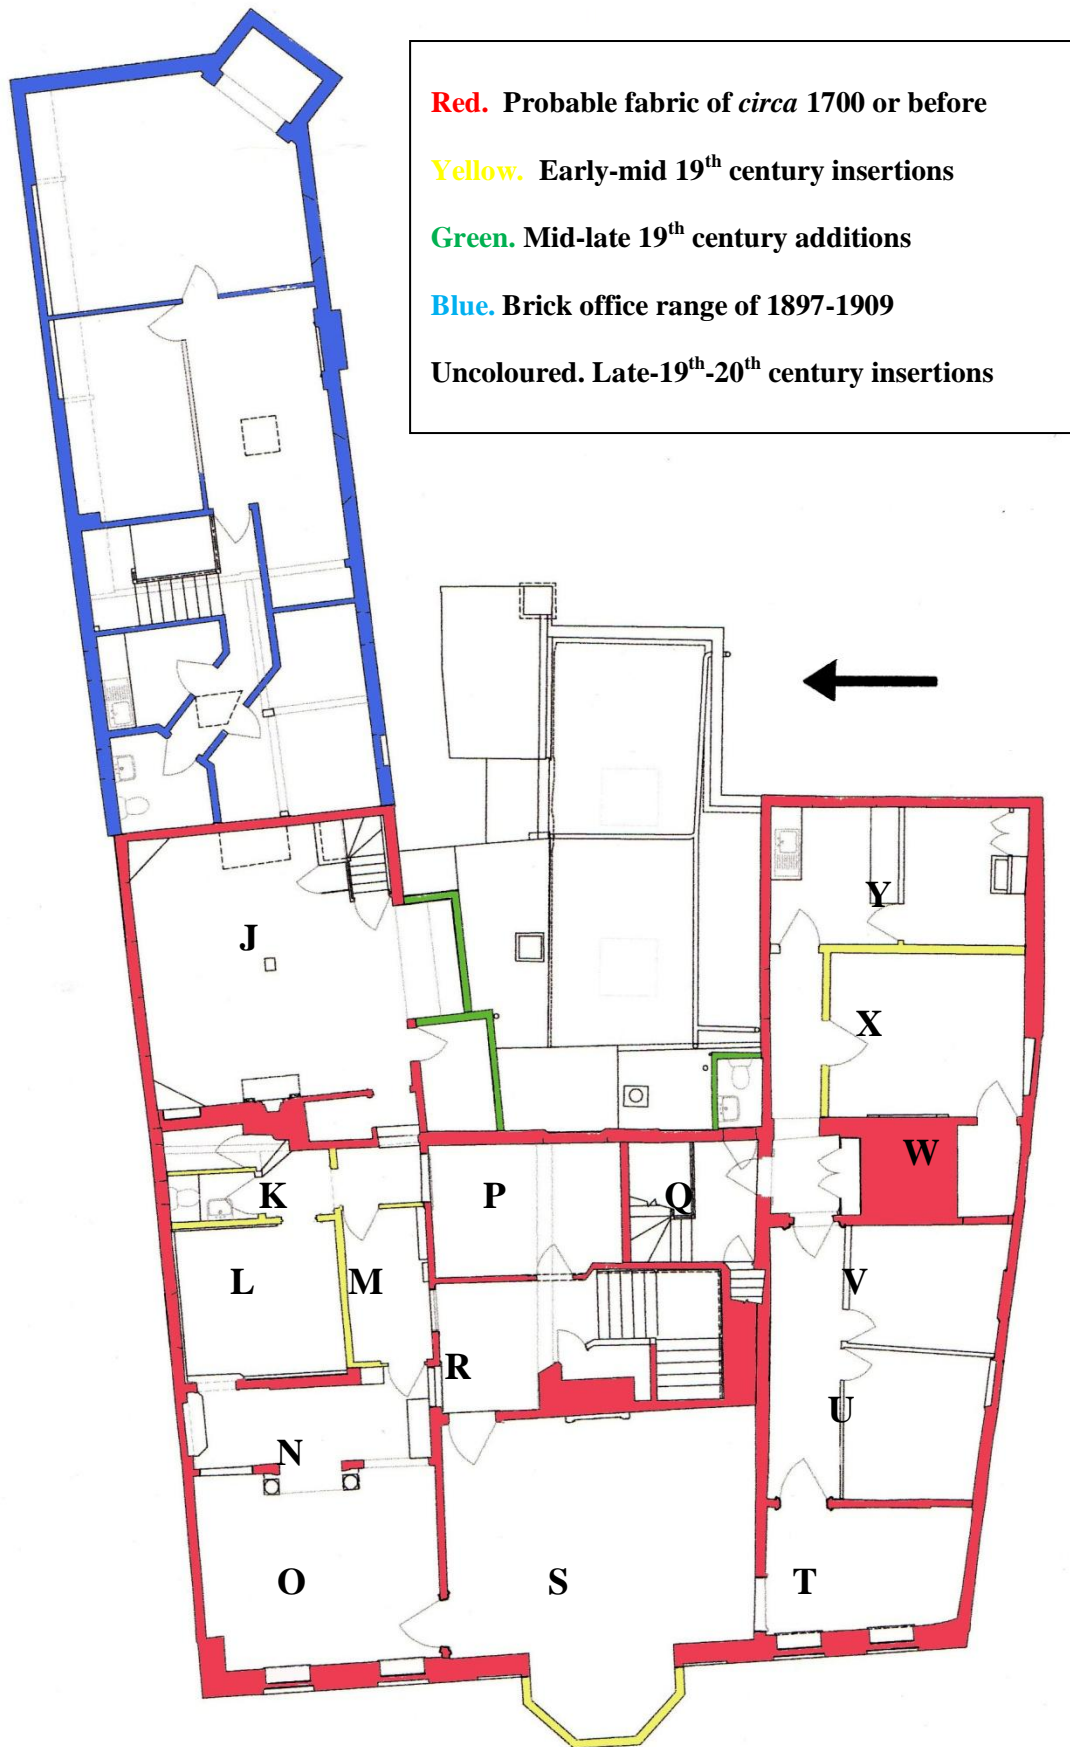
Colour-coded historic first-floor plan based on a survey by Randalls.
